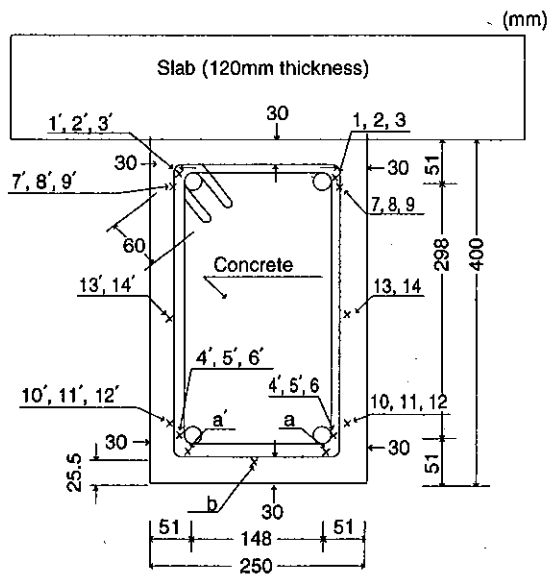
Cross section of the conventional type of reinforced concrete specimen hereafter called as the R.C. specimen.
